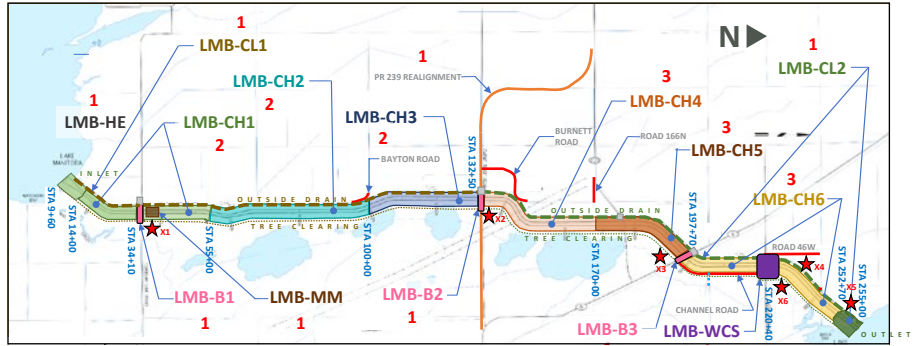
Updated Lake Manitoba Outlet Channel: Construction Sequencing and Contracting Strategy
